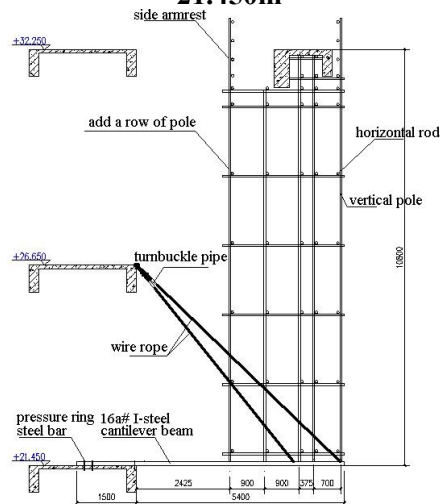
Profile of Cantilever Formwork Support Erection (Cantilever Type)
